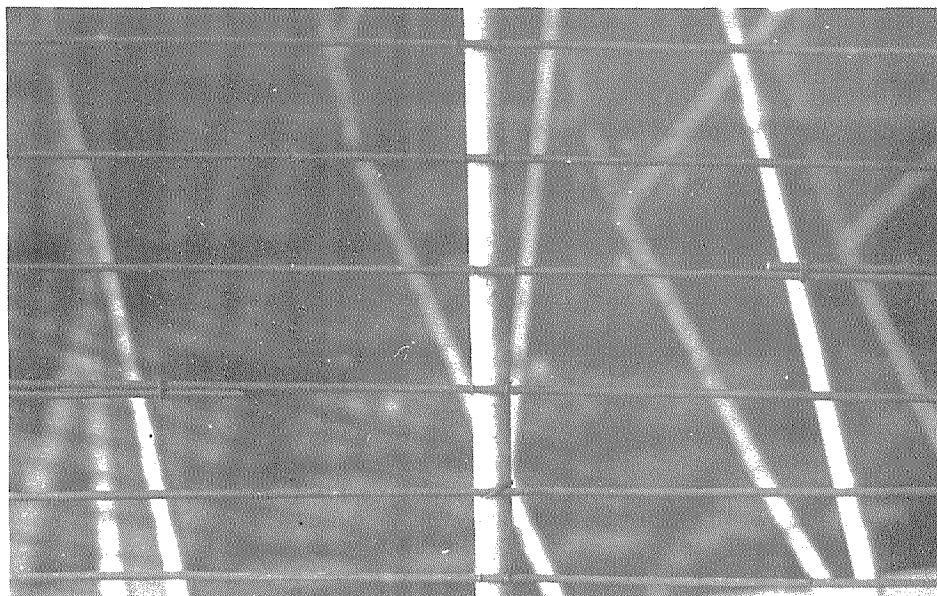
Detail of longitudinal rods tied to a pipe frame.
